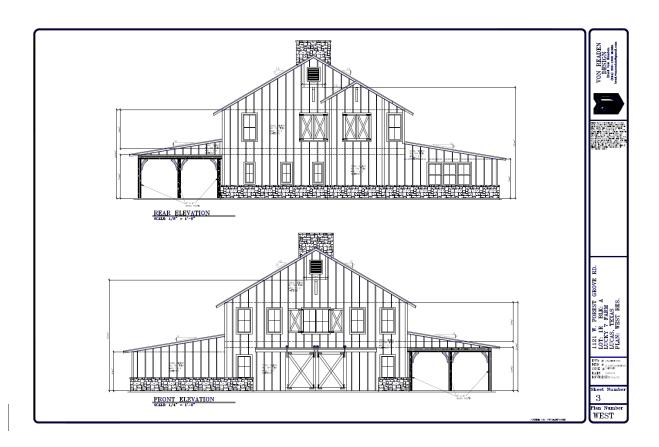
EXHIBIT "D" EXTERIOR ELEVATIONS PLANS
